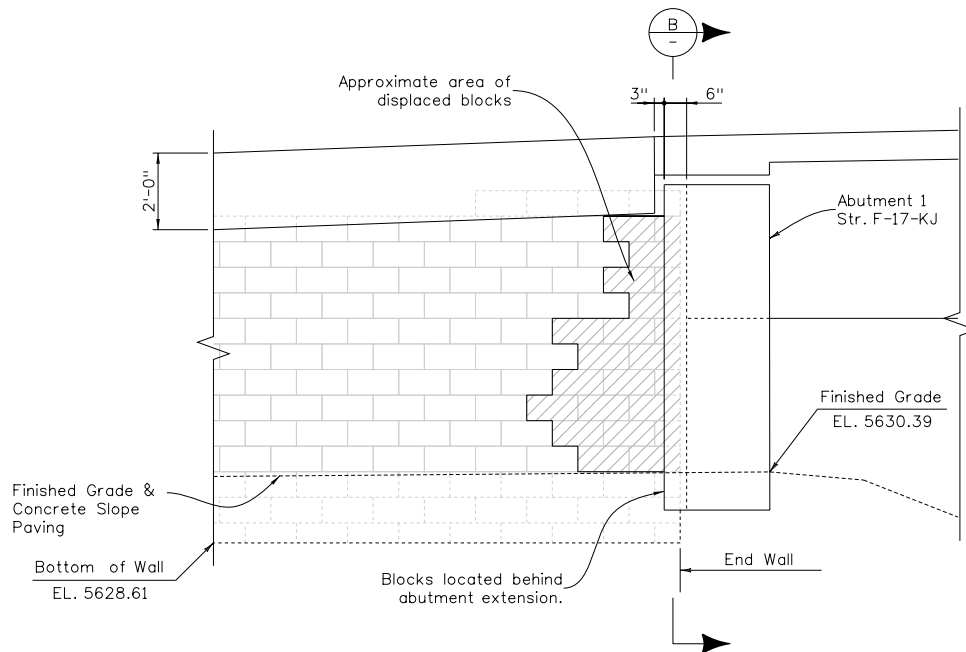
(J)-1 Sample Elevation of Area to be repaired on a MSE Wall
